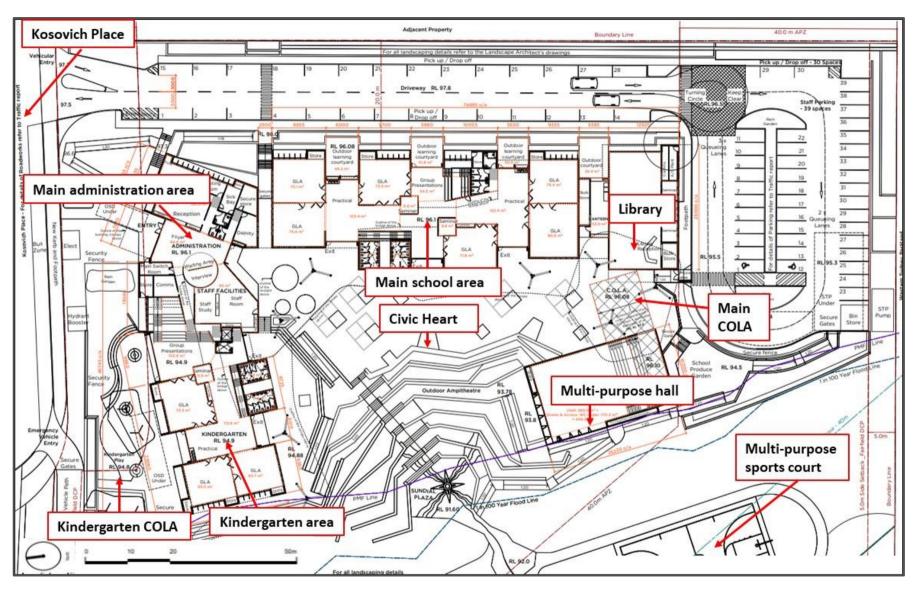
| Ground floor building layout and orientation (Source: Applicant's EIS 2018)
